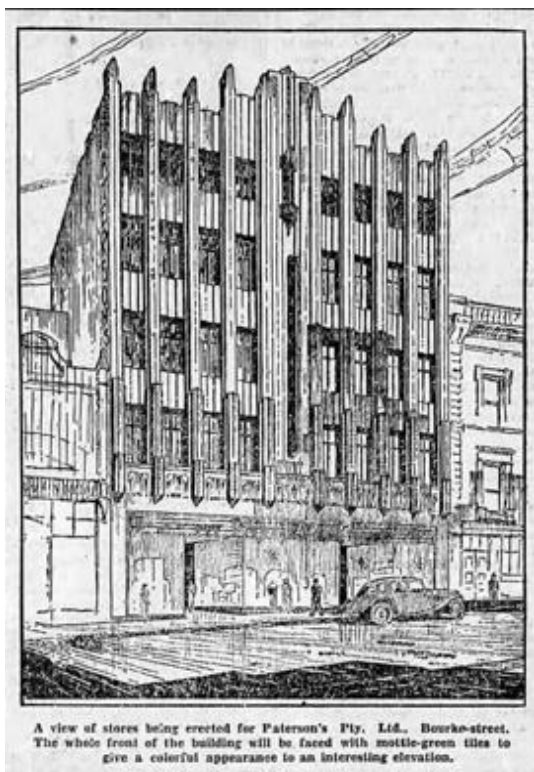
Purnell's sketch of the new Patersons building at 152-154 Bourke Street, 1934. (Source: Age 27 March 1934:5)
